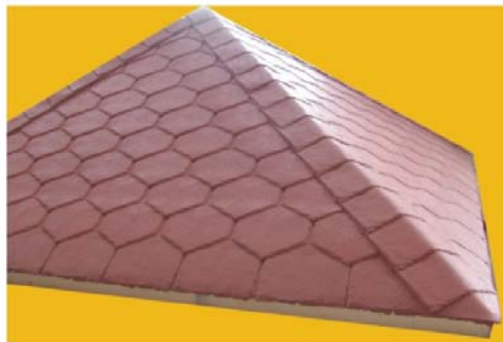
Install the first piece at the bottom of the hip. Cut the top shingle to line up with the other shingles. Mold shingle to the shape of the hip.
